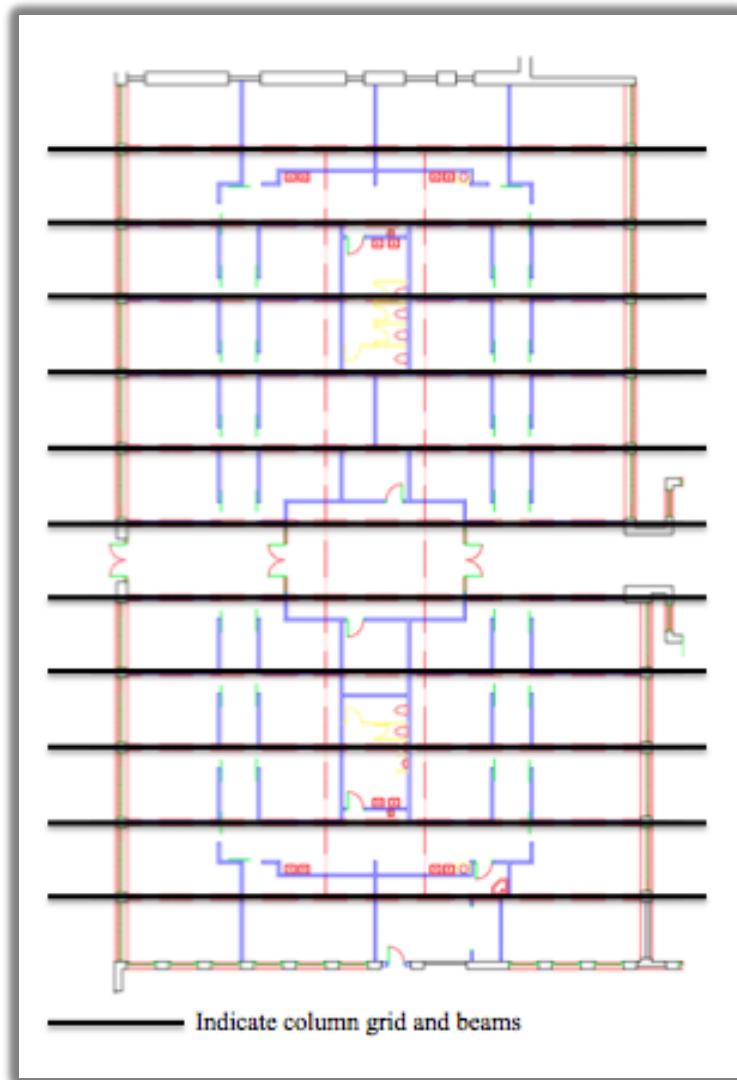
Golden Belt Mill, Building 3. The architect inserted partial walls within the open interior of Building 3 in order to create multiple personal artists studios. The placement of new walls reflected the structural beams and column grid patterns, as well as window placements. The black lines indicate the column rows, overhead structural beams, and partition walls between artists spaces. Courtesy of Belk Architecture / Megan klem.
